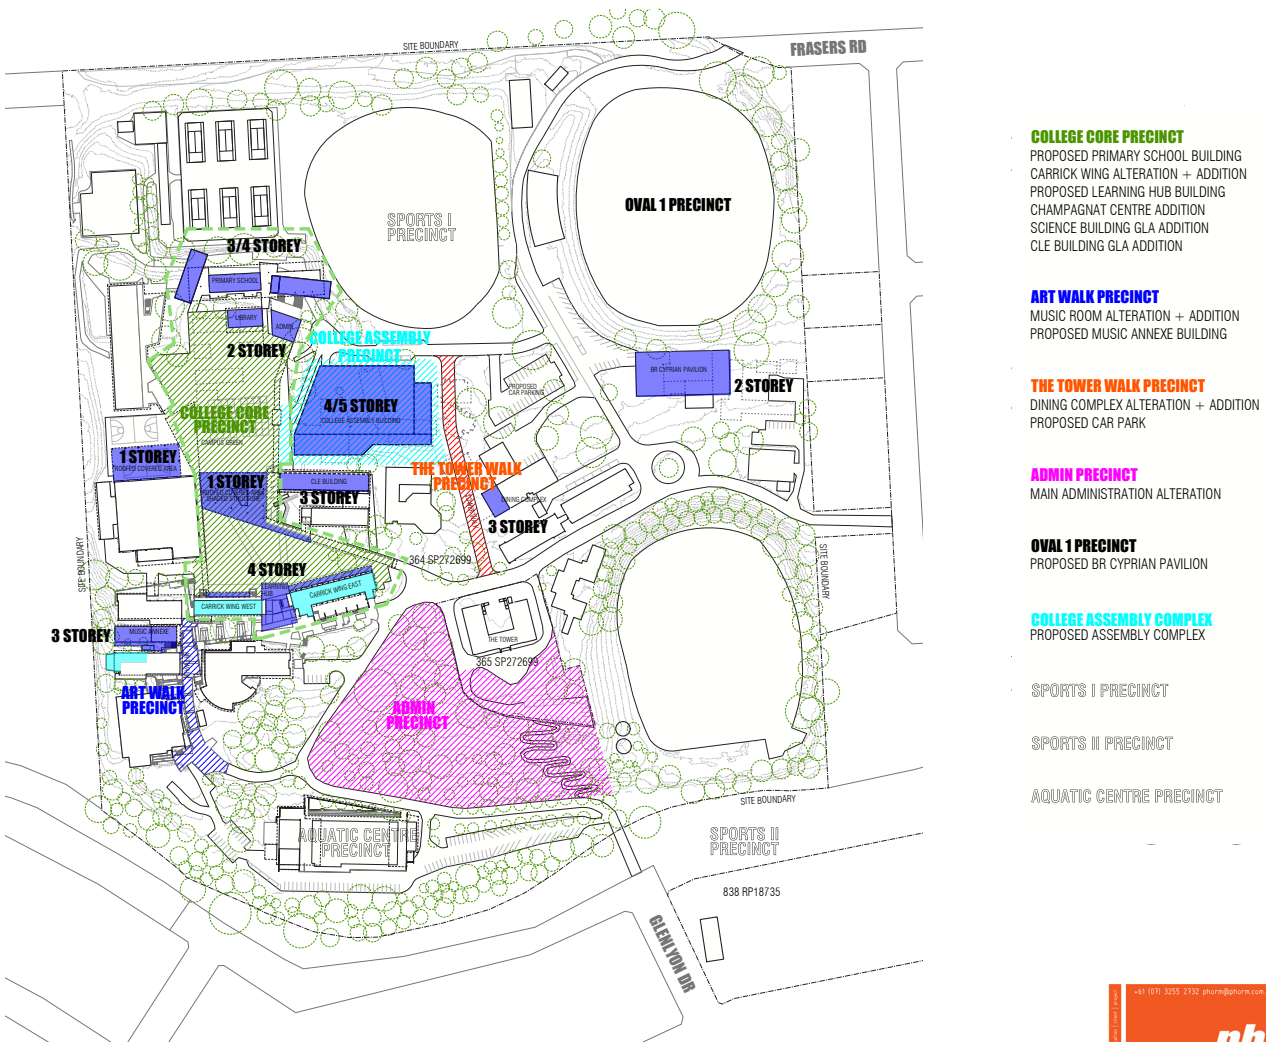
Marist College Ashgrove – Building Improvements Plan Extract
